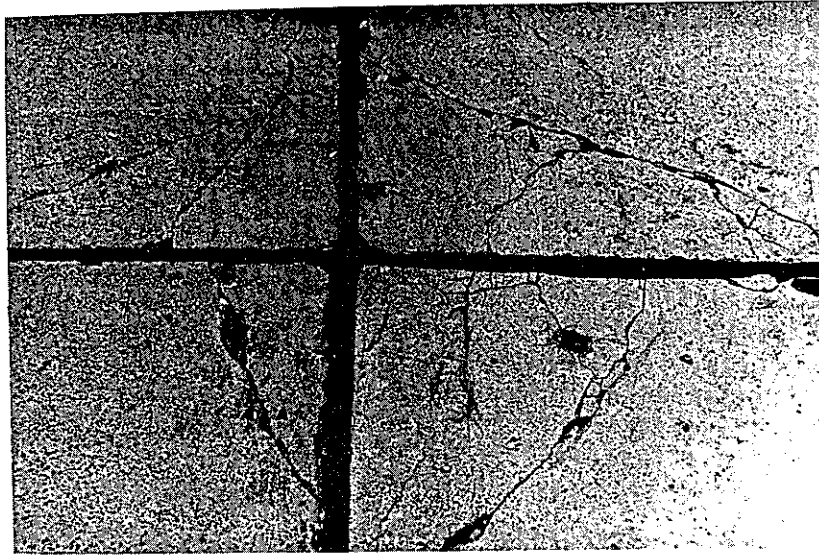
Taxiway; "D" cracking at intersecting joints in heavy duty PCC pavement.
